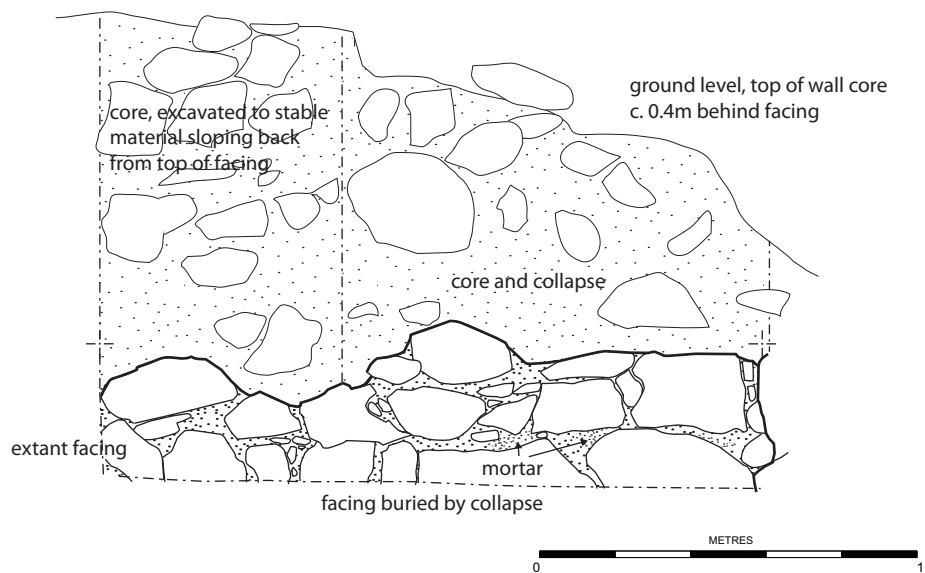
Trench 3, D-shaped tower. Elevation of western wall
